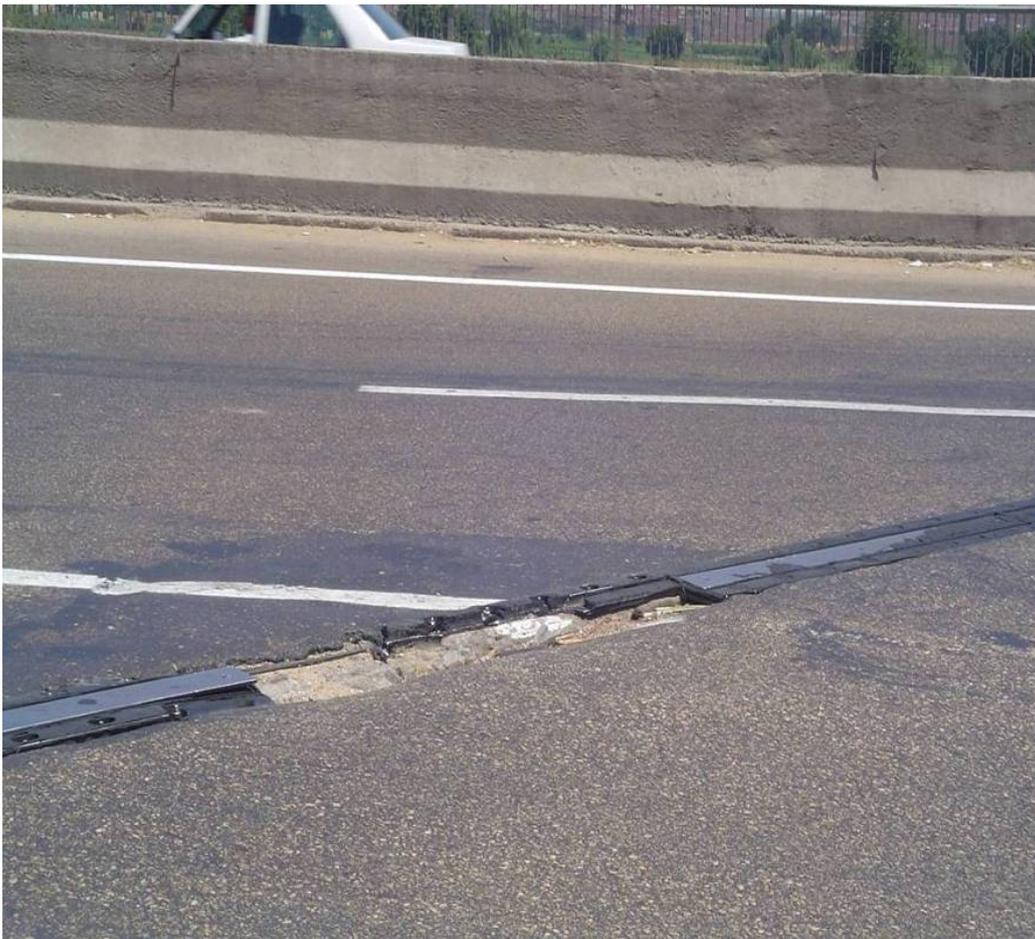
Damaged bridge joint, inner carriageway, (km 67.3).
